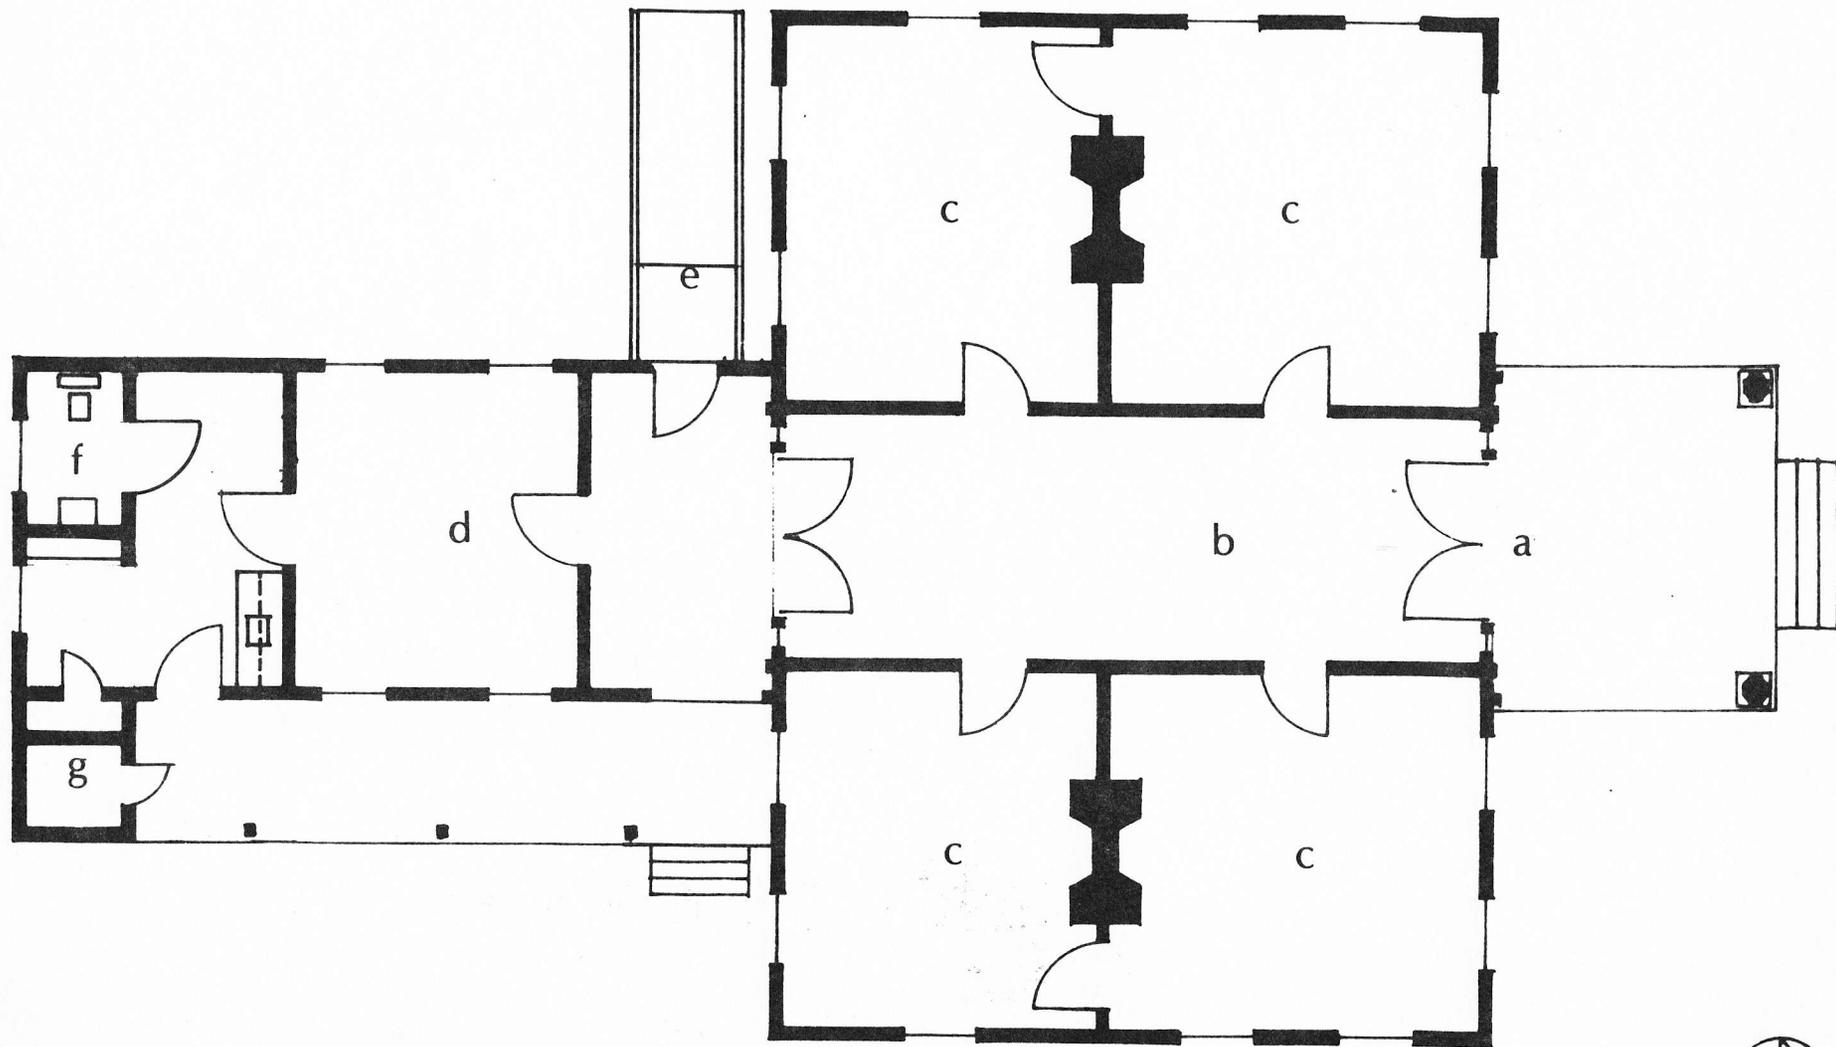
Arnold-Simonton House, Proposed Floor Plan
